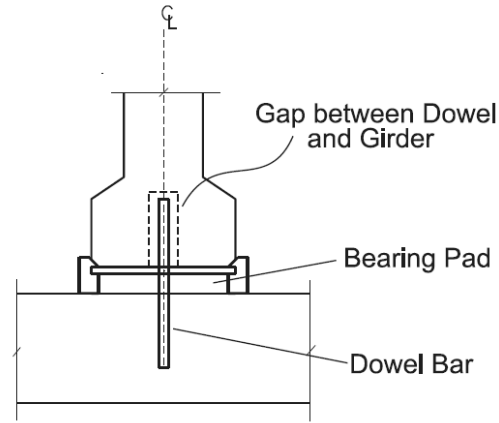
Cross-Sectional Layout for Bent Beam and Column for Multi-Span Simply Supported Concrete Girder Bridge.
